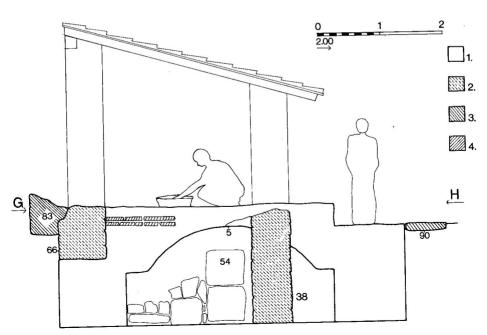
Building I, section across Roman vault, suggested reconstruction of roof pitch. 1. Roman walls; 2. Building I, phase 1; 3. Building I, phase 2; 4. steps in brick.
